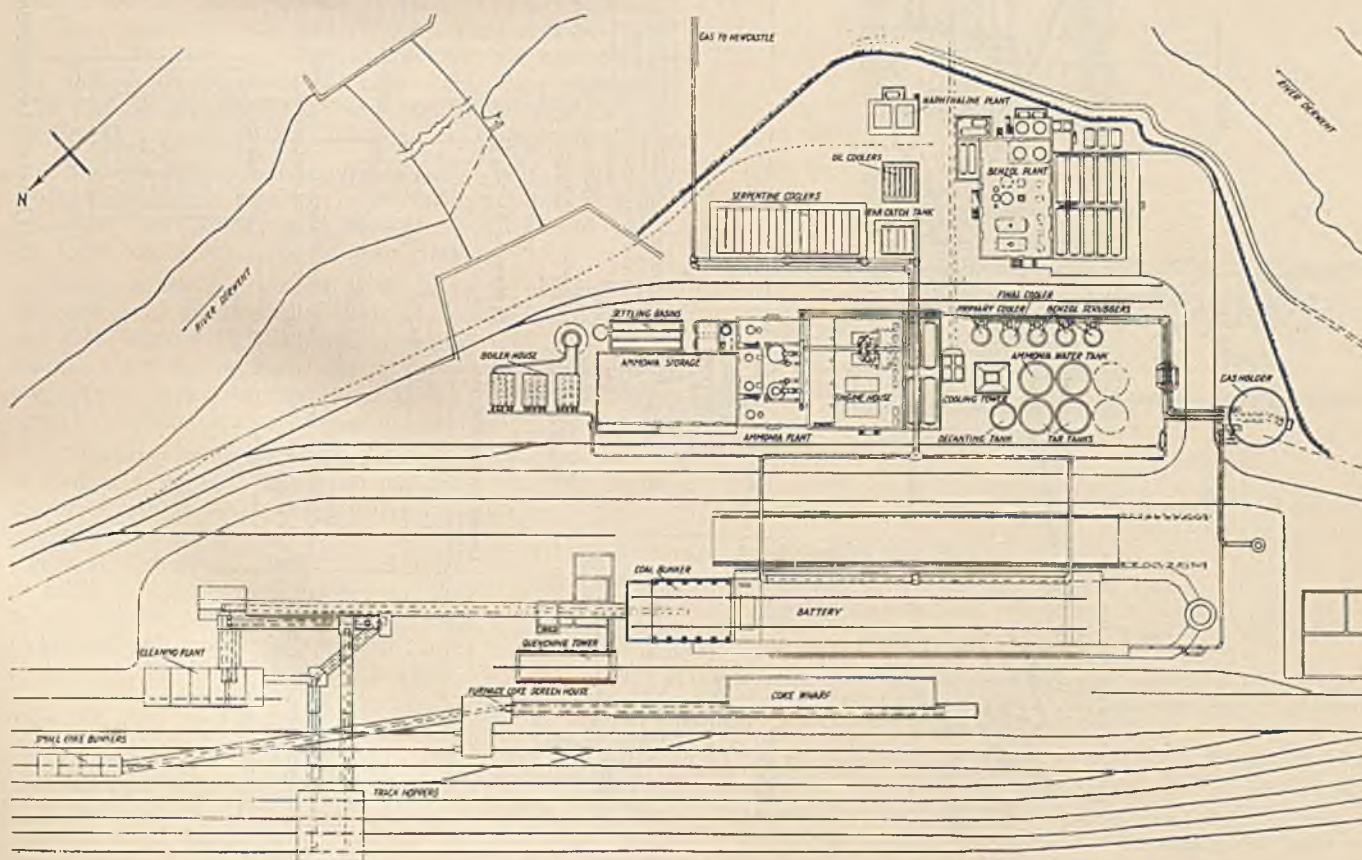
General Layout of a Modern Coke Oven Plant—Derwenthaugh.
